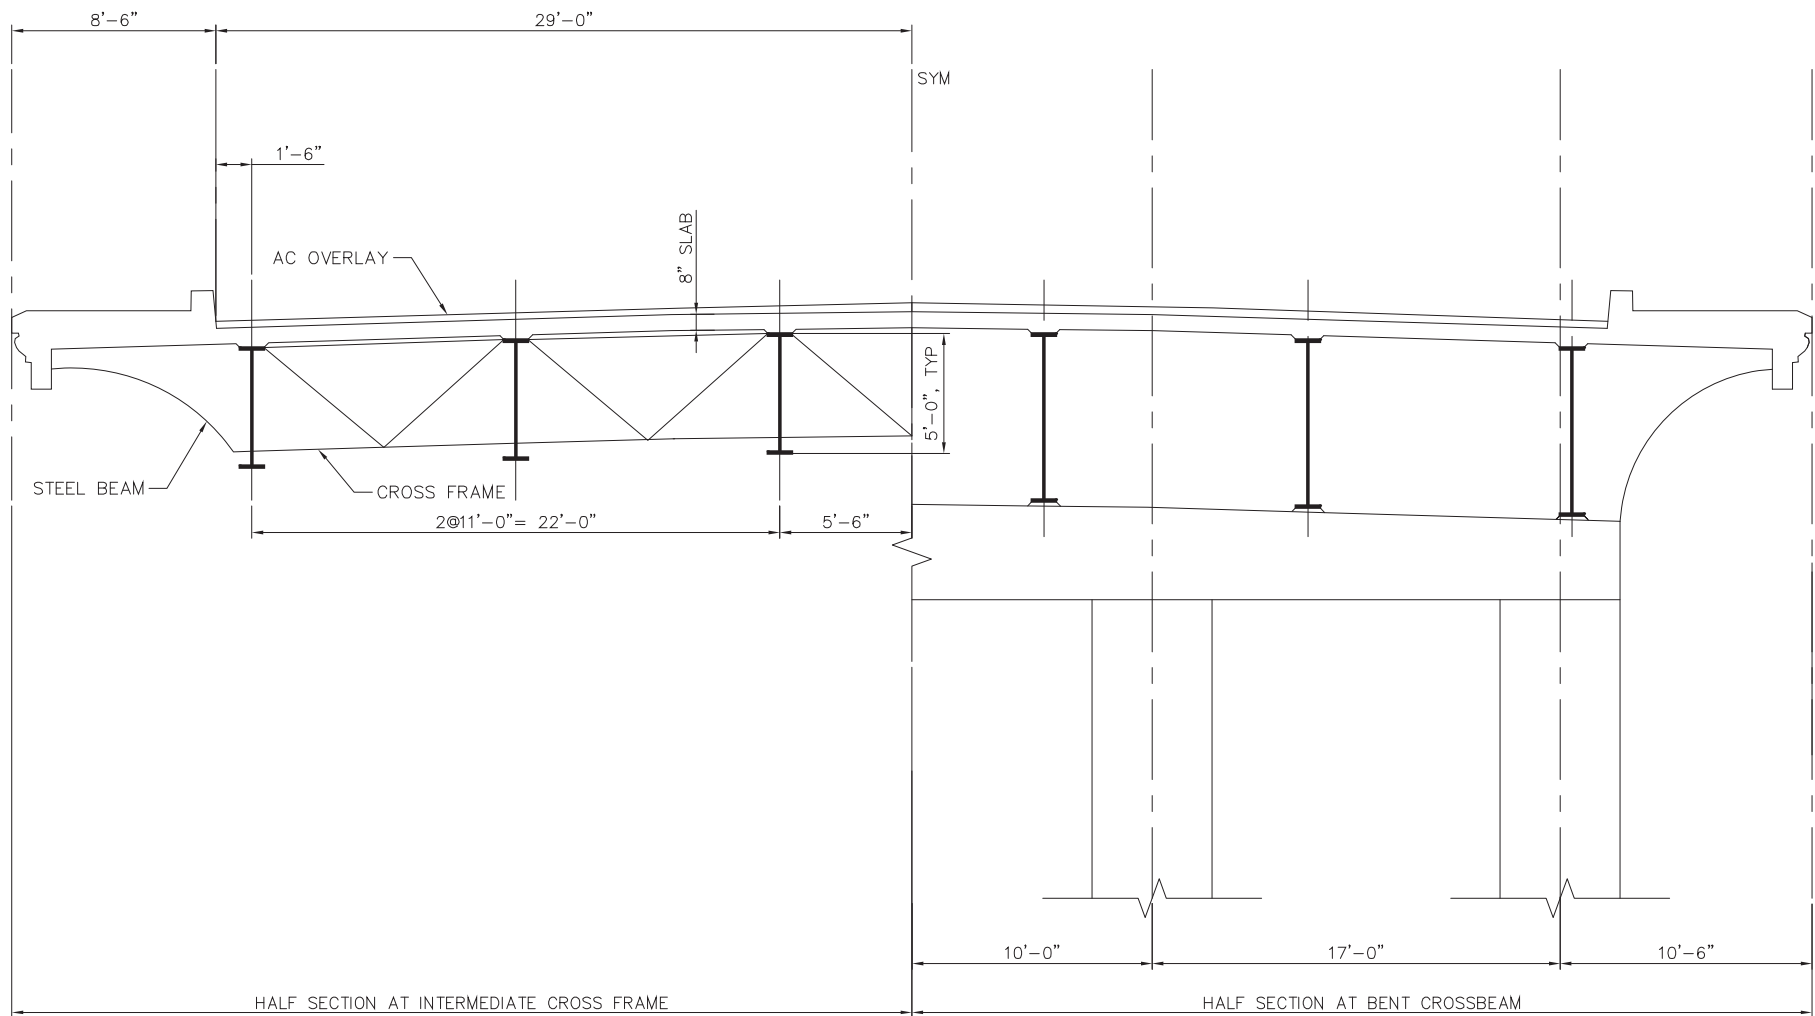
STEEL I-GIRDER DECK SECTION
